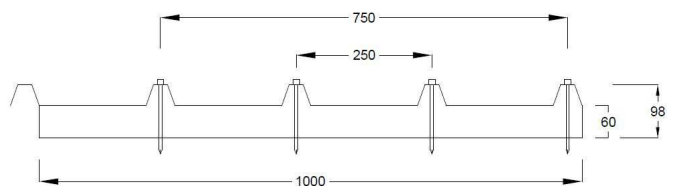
Schematic configuration of TeraSteel IsoAc5 sandwich panel and screw positions.
